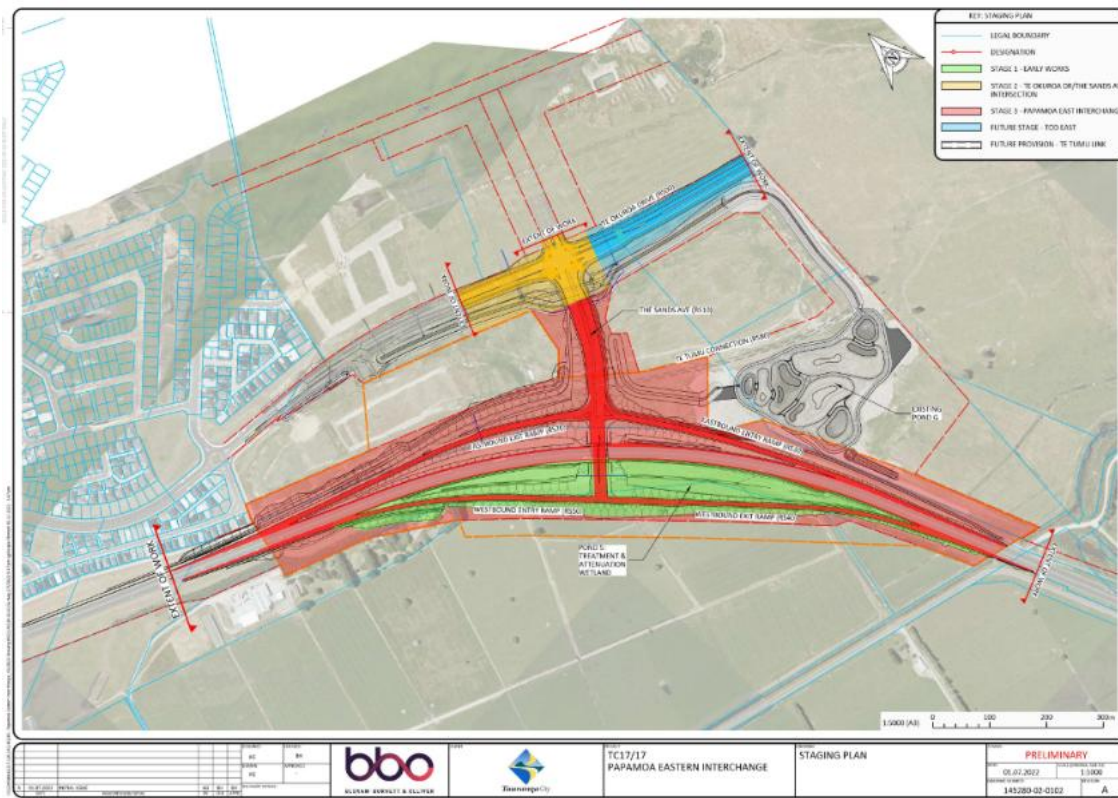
Papamoa East Interchange Design and Construction Staging (Source: TCC)
